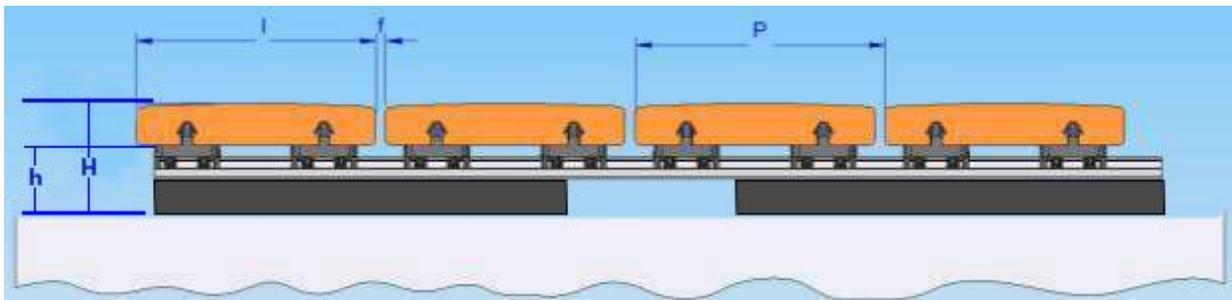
cross section of wooden planks laid solid aluminium substructure KIT 60 fixed height
